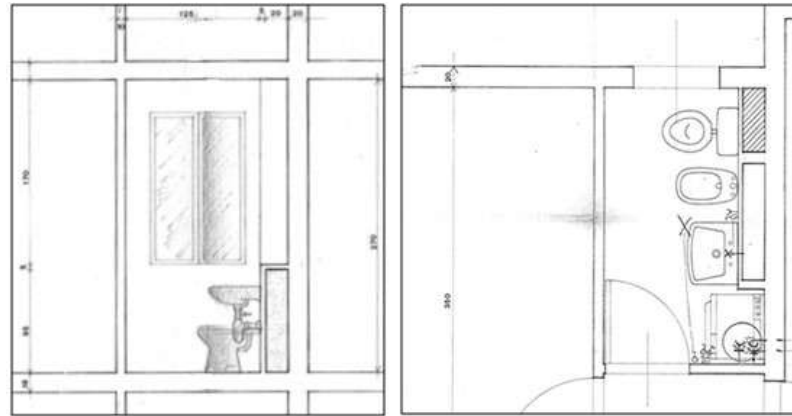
Toilet-LAYOUT E. Section of the toilet (left). Plan of the toilet (right) (F108.4T9).
